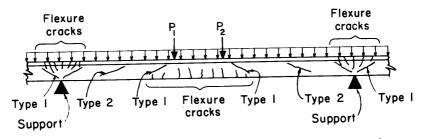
Types of diagonal cracks occurring in a prestressed concrete member
